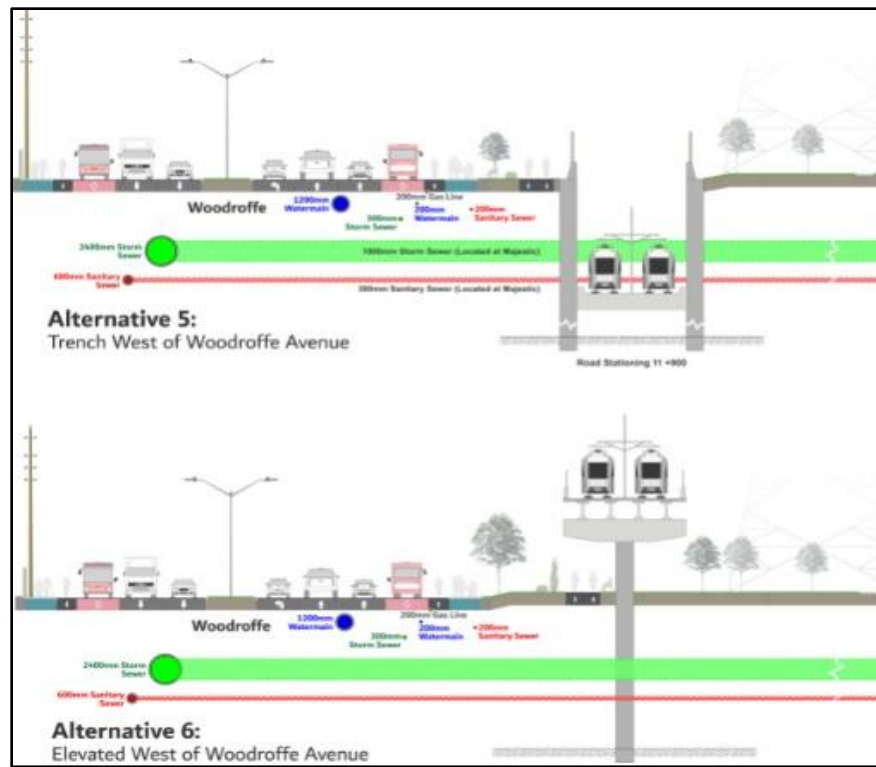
Underground Utilities and Below-Grade and Elevated Alternatives
